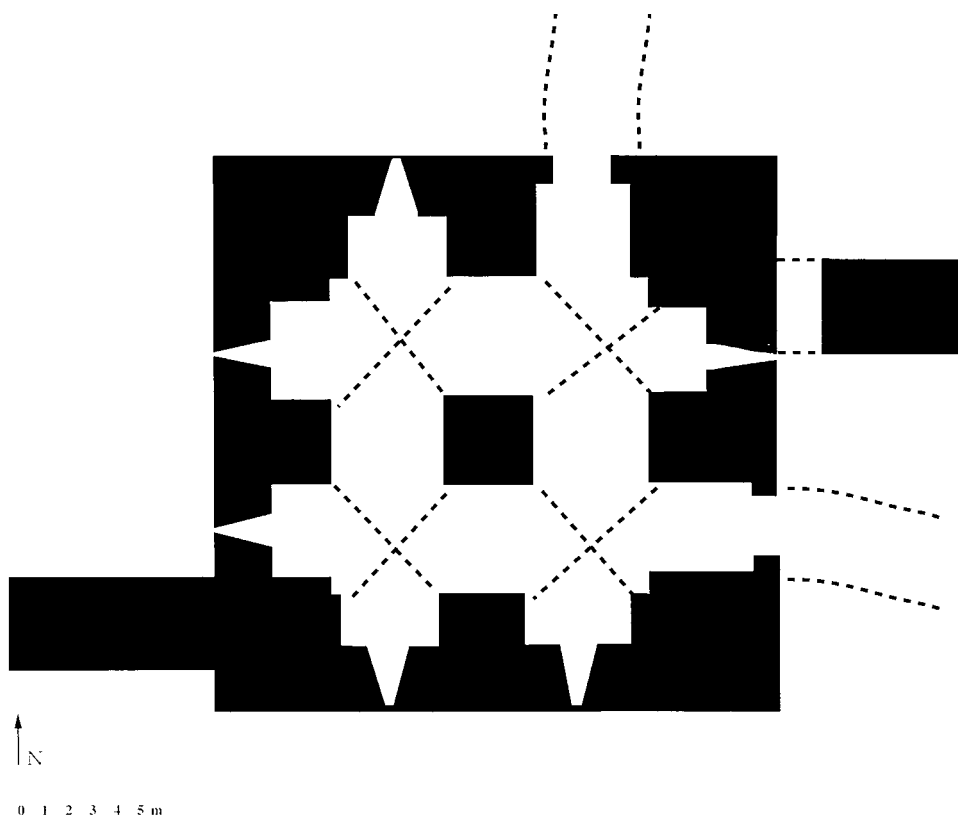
Plan of the medieval Mount Zion Gate Tower (after Ben-Dov 1983).
